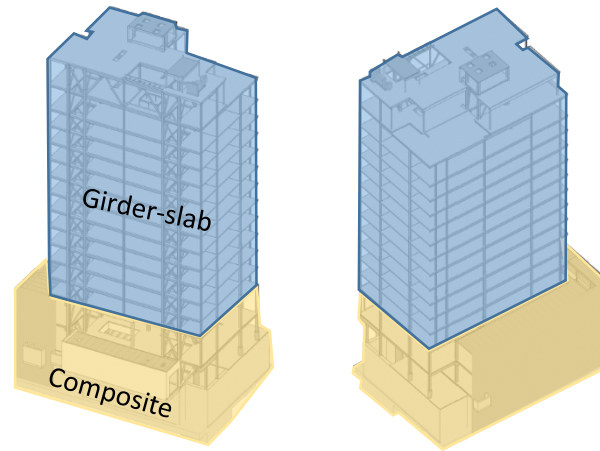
Existing structural Skeleton of AC Hotel Philadelphia.
